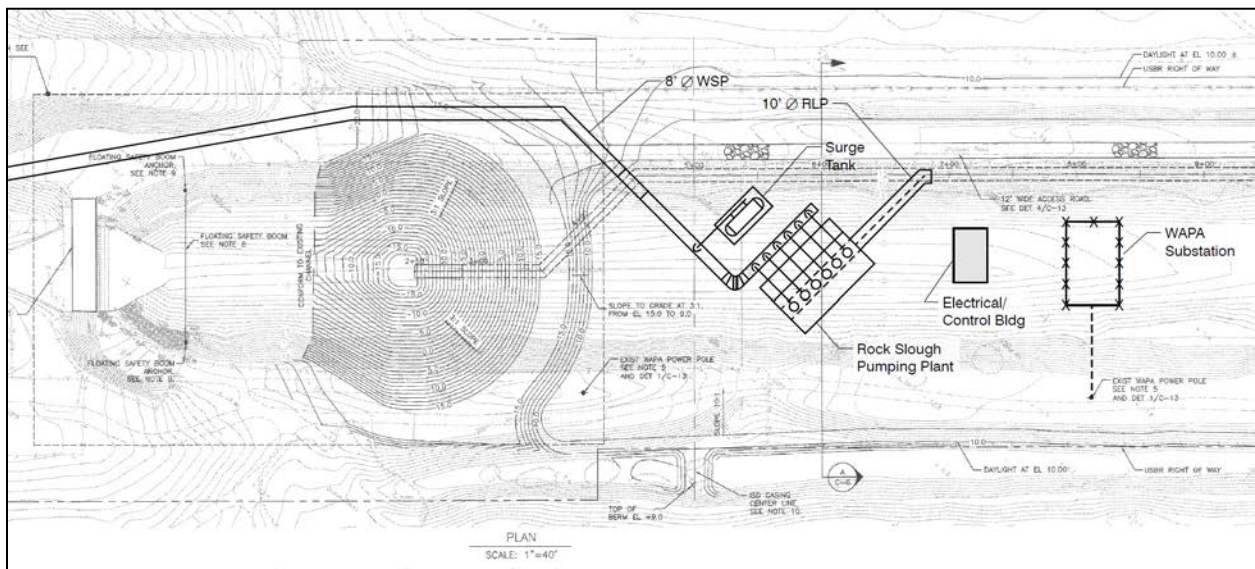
Alternate Location for Rock Slough Pumping Plant No. 1
